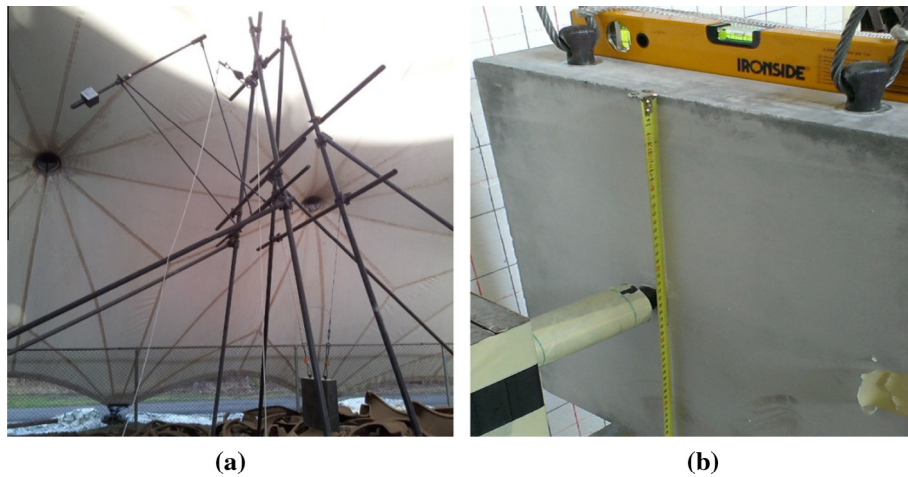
Maximum height of the hammer (a) and the concrete slab central point impacted by the hammer (b).
